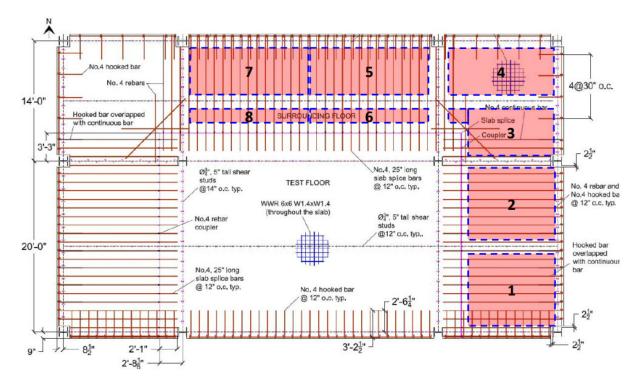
Plan view of test floor, surrounding floor, and perimeter slab removal areas. (1 in. = 25.4 mm and 1 ft = 0.305 m)
